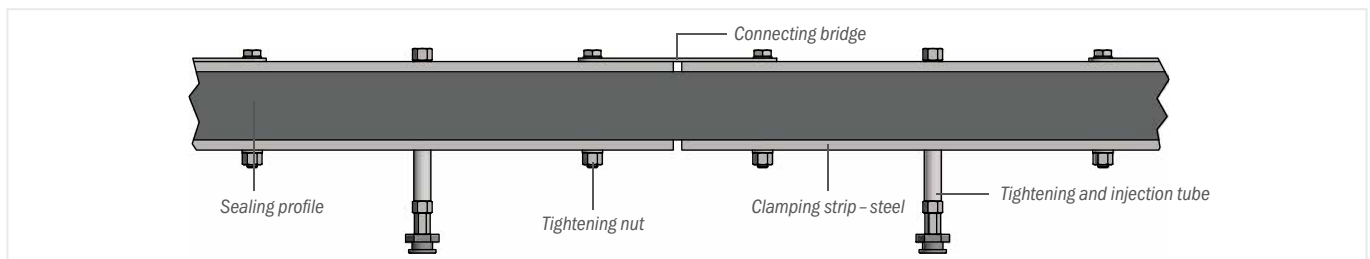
DESOI Quick Seal, sealing and injection profile for sealing and injecting leaking movement joints
